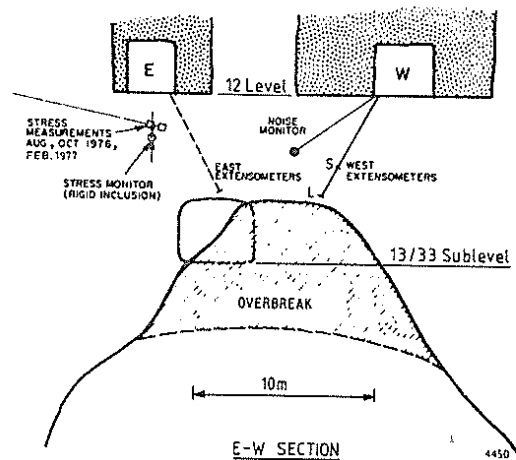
E-W section of Panel 10 crown pillar showing overbreak and monitoring installations.
